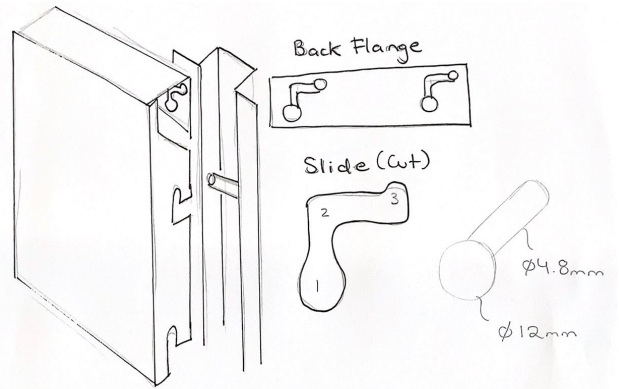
Alternative 1: Slide connection (Sketch made by author)
